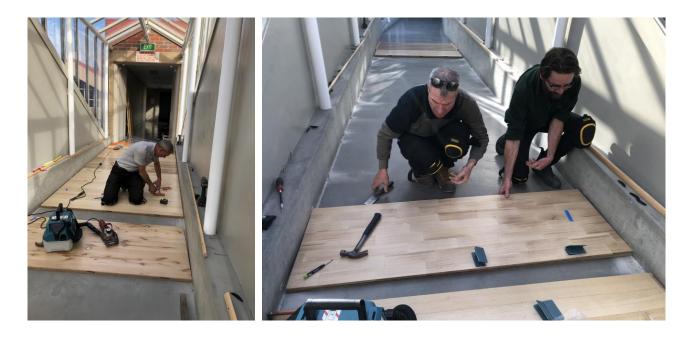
Concepts being installed on commercial site: same venue and installation practice used for solid flooring trial was replicated.
